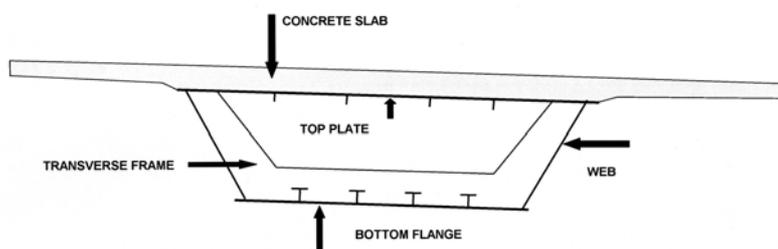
Single closed box girder (pavement unidirectional banking)
